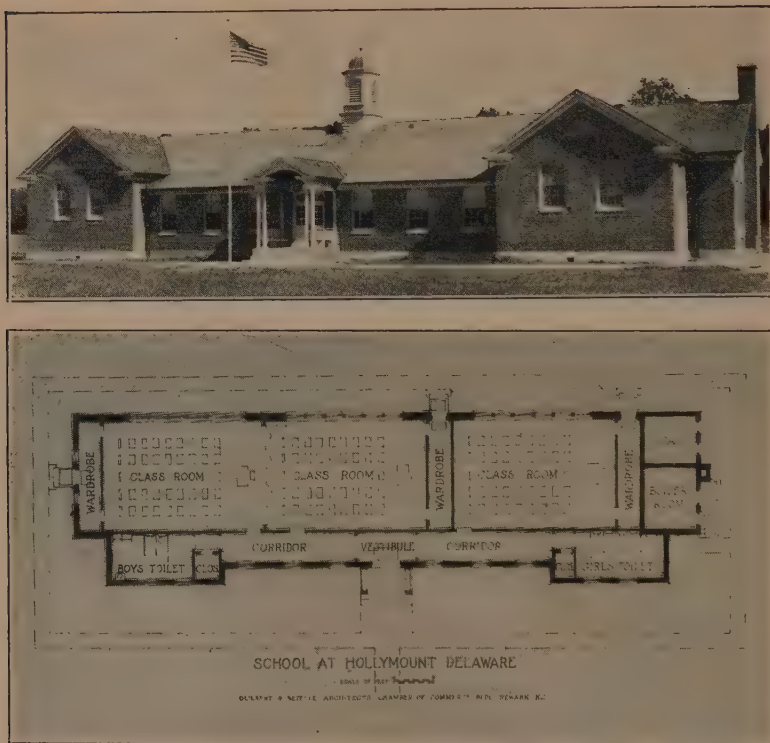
This three-teacher school has a well-arranged floor plan. Note the outdoor exits to the wardrobes
